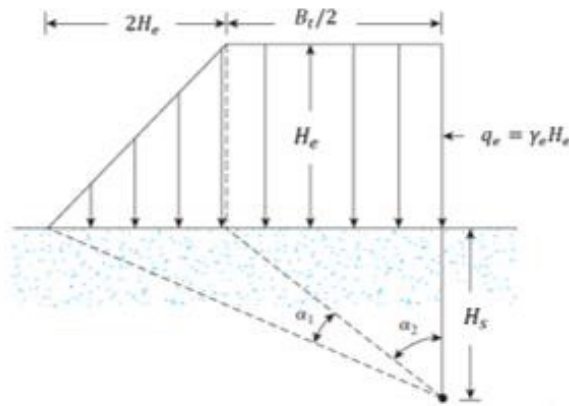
Stress Reduction Due to Embankment loading considering 1V:2H Side slope [3].
